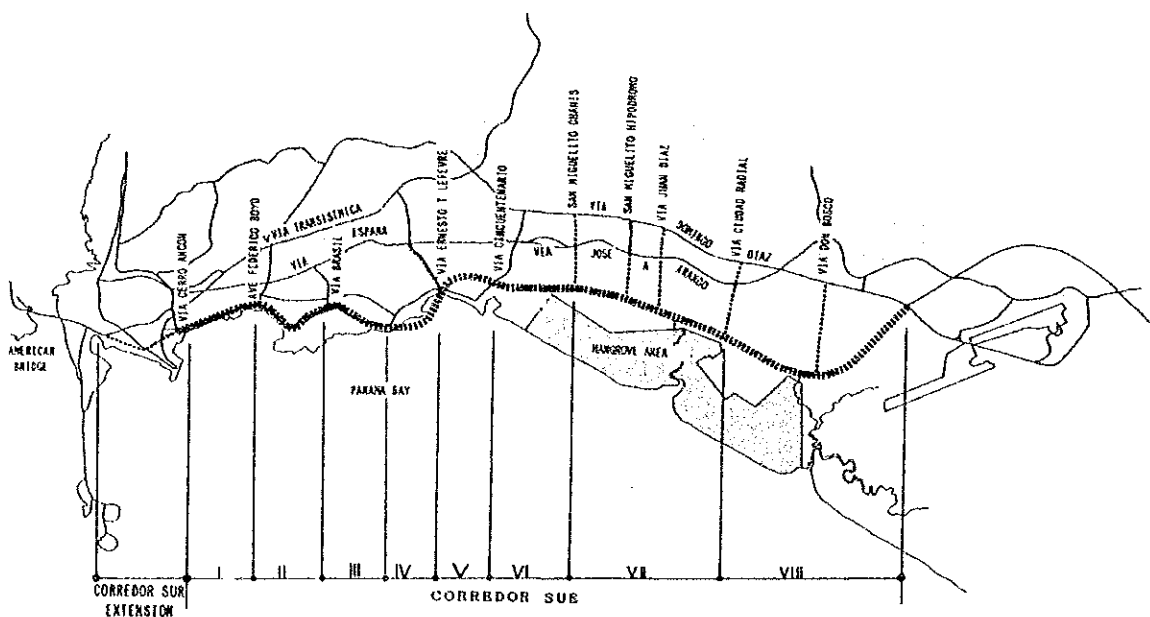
DIVIDED SECTIONS OF CORREDOR SUR
